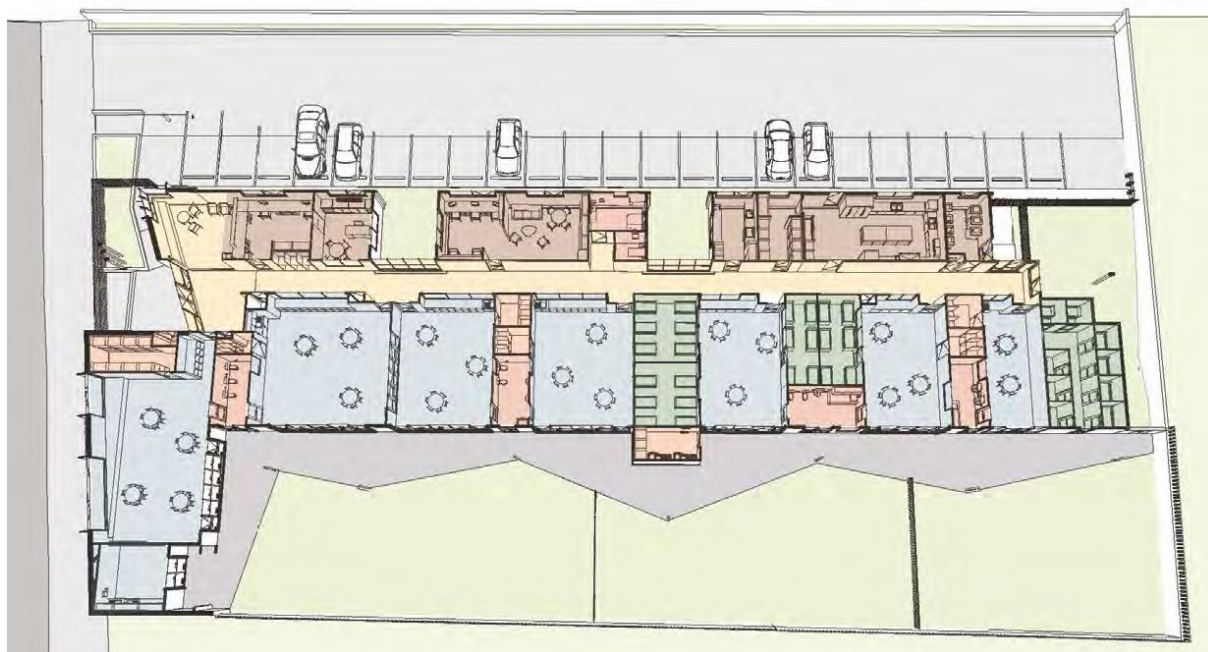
Cutaway plan showing arrangement and relationship between rooms within an education and care service.
